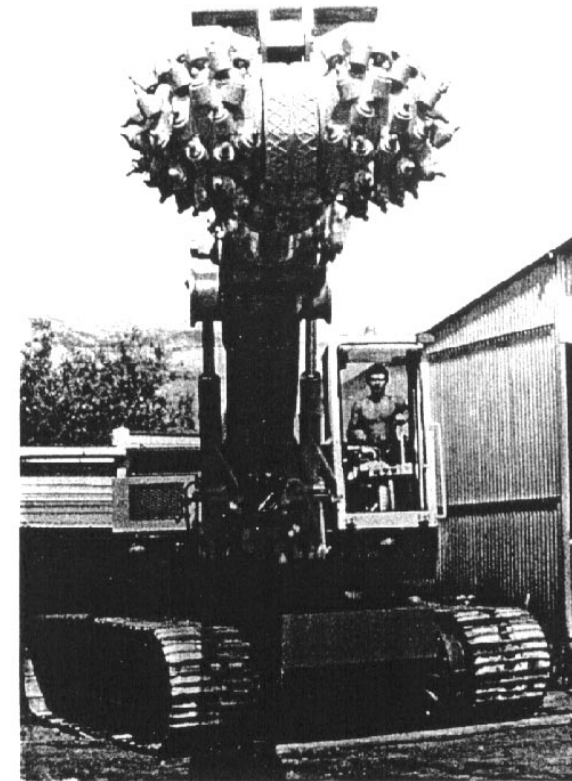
50. Excavator with 100 kW cutterboom.
